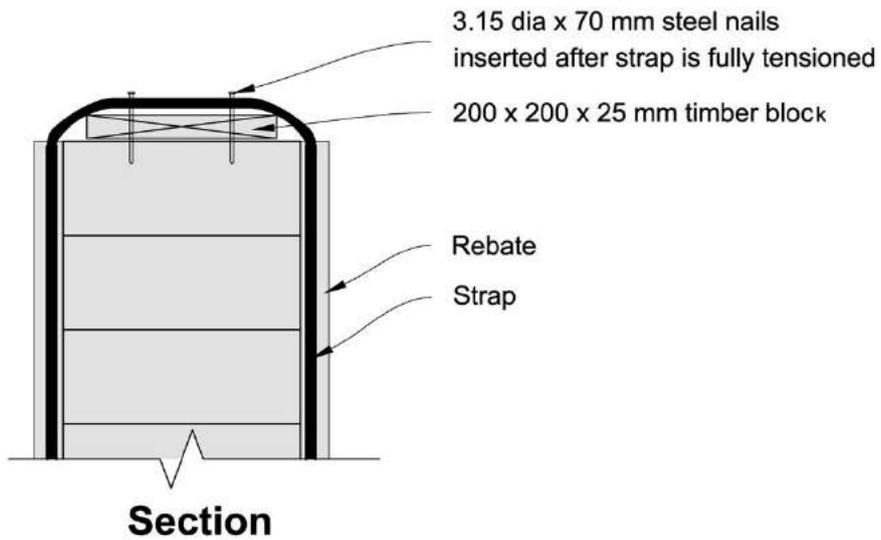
Where straps do not meet rafters they should pass over a short wooden block and be nailed to it after tensioning.
